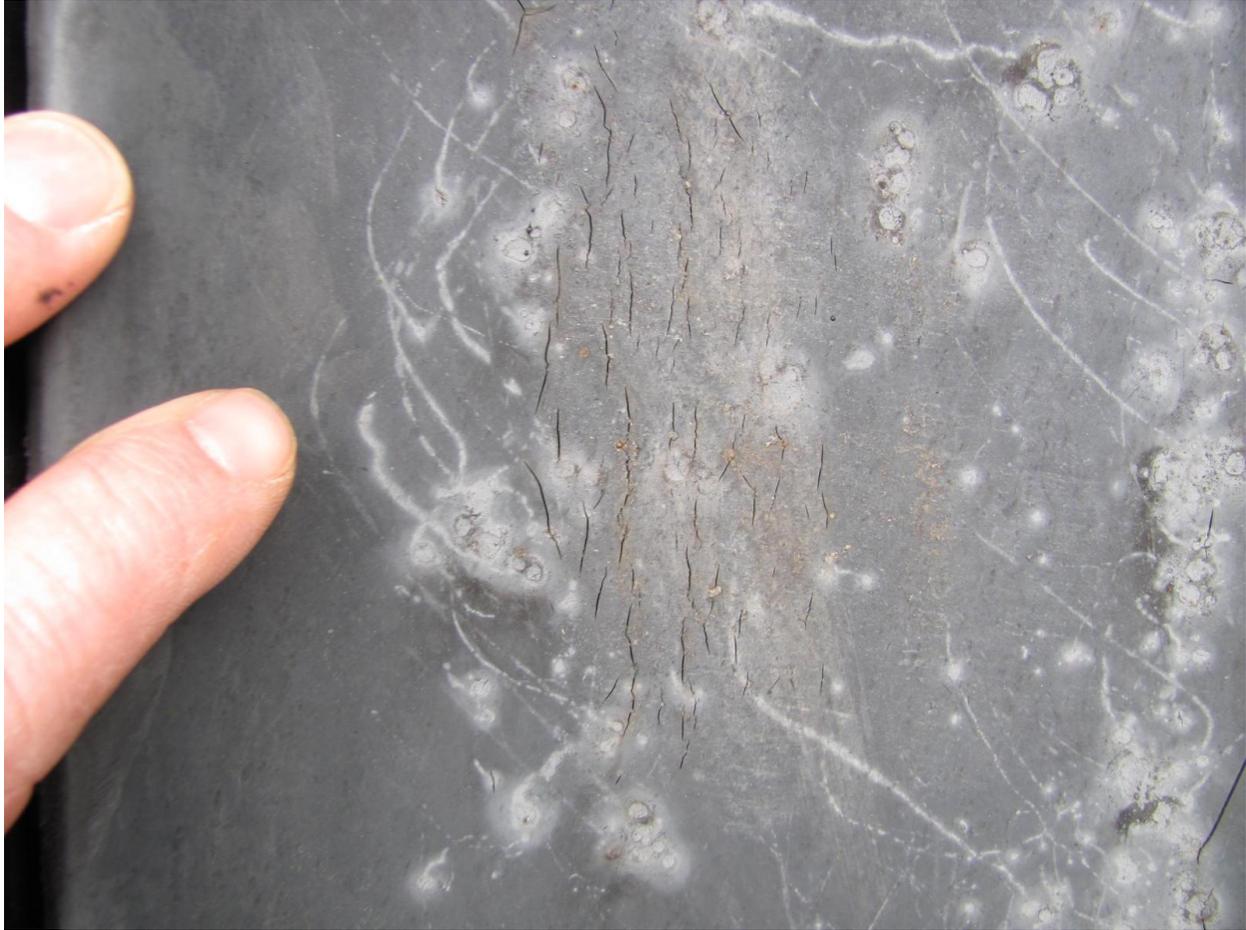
Short, multiple, irregularly orientated coating cracks.
